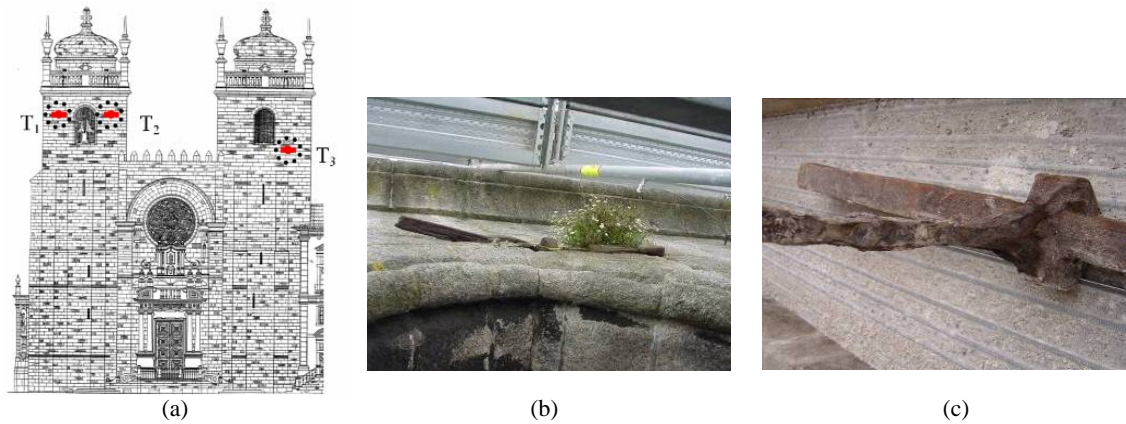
Ancient tower ties: (a) Deformed anchorage of tie T1 and (b) details of broken tie T3.
